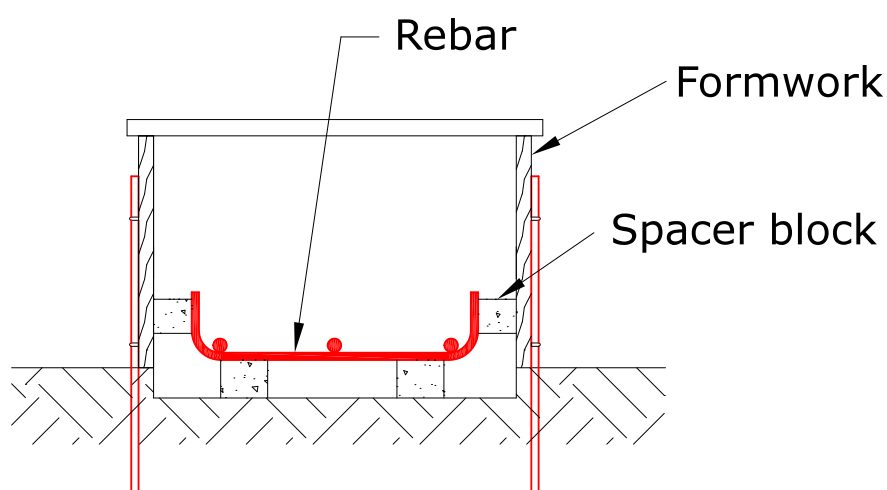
SPACER BLOCK ARRANGEMENT FOR STRIP FOOTINGS
